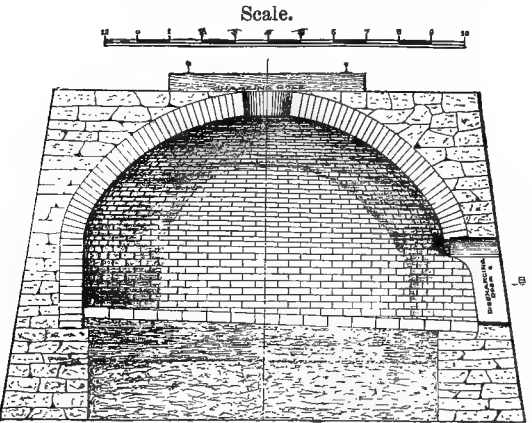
American Bee-hive Oven.—Vertical Section.
